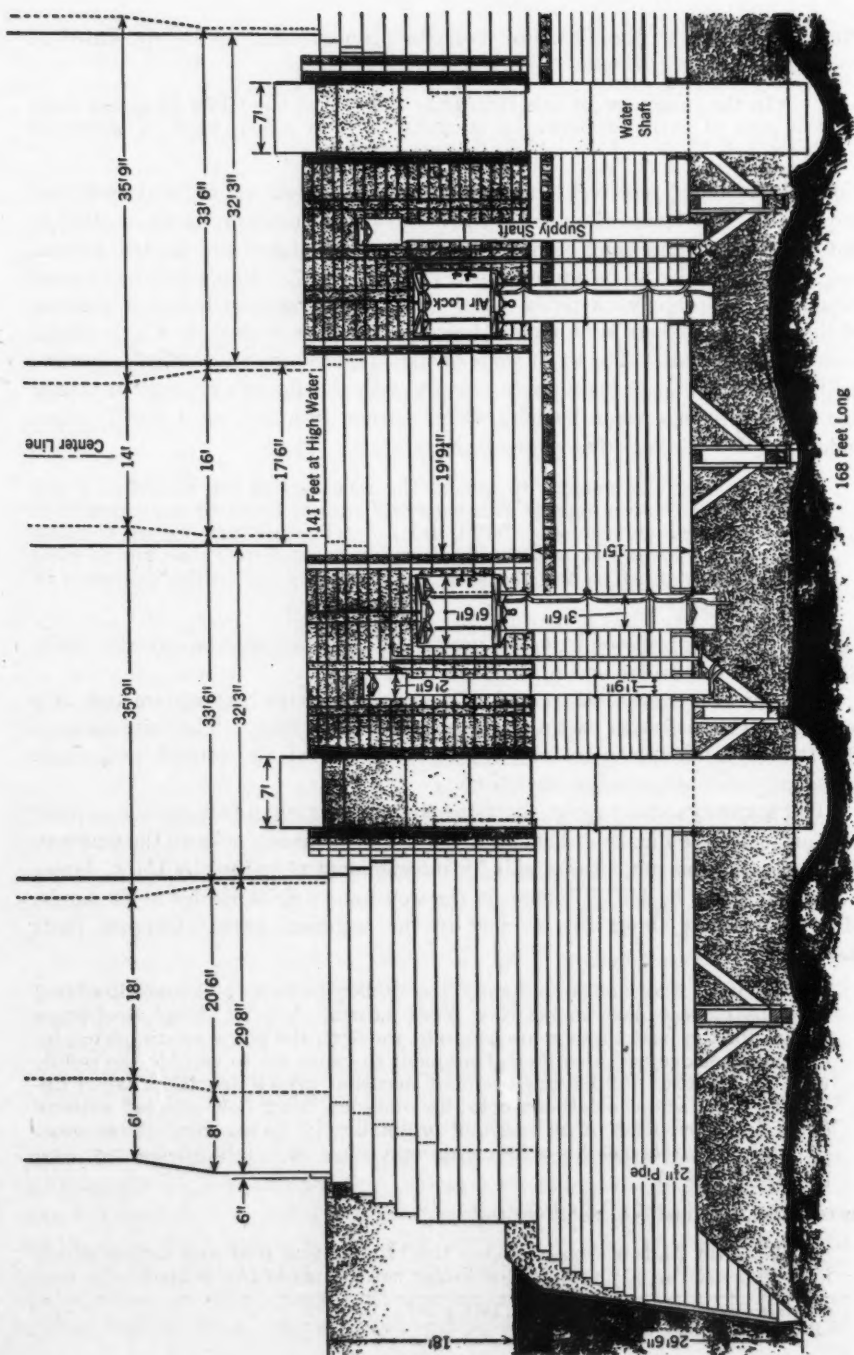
LONGITUDINAL SECTION, BROOKLYN TOWER CAISSON
